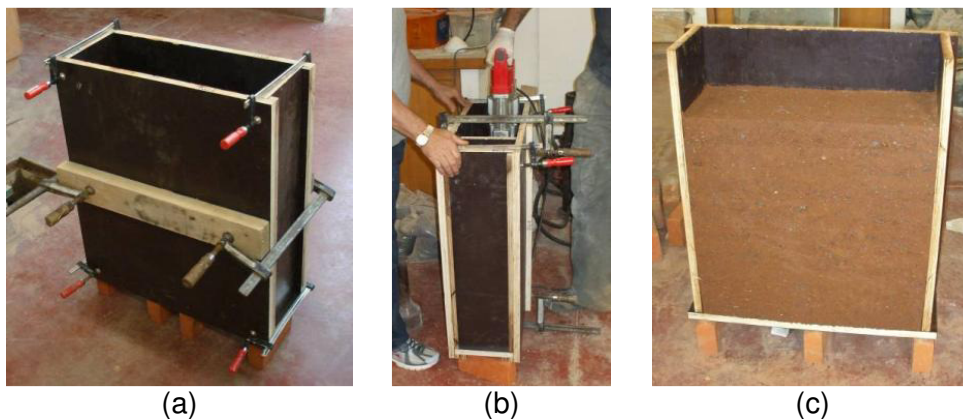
Manufacturing of the wallet specimens: (a) plywood formwork; (b) compaction with an electric rammer; (c) demoulding.
